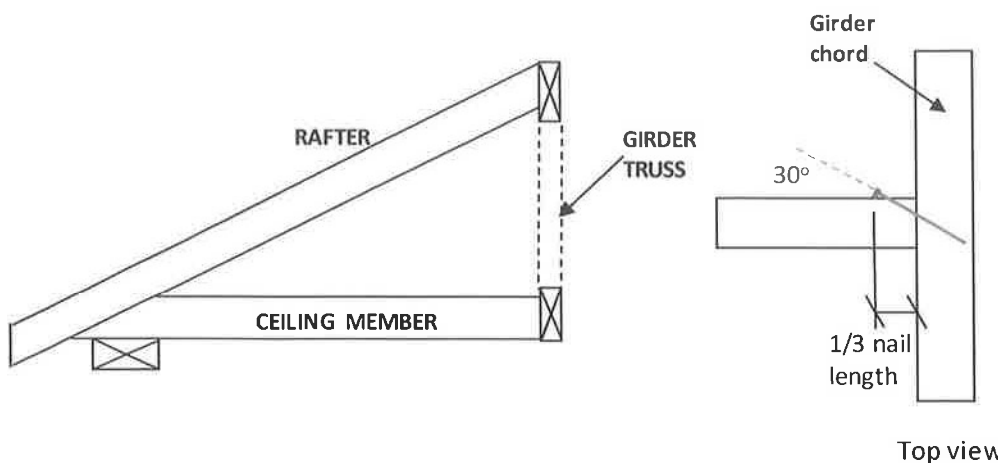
Toe-Nailing Rafter / Ceiling Member to Girder Truss
